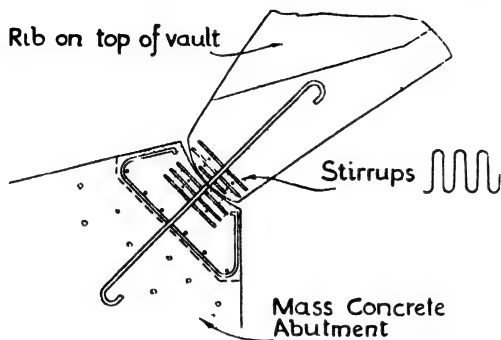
Reinforced Concrete Arch Hinge, Contact Type.
